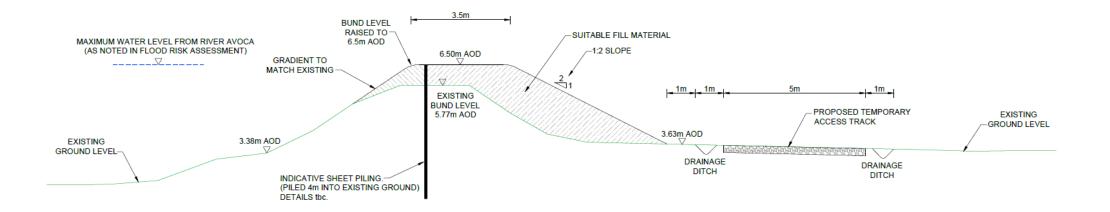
Proposed Flood Defence Embankment Improvement Works – Indicative Cross Section
